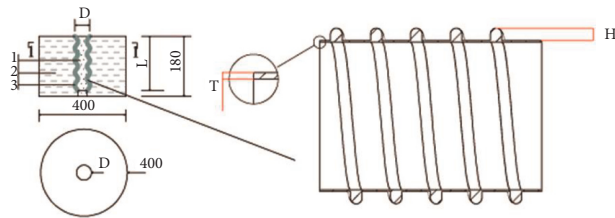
Specimen size and pipe size (mm). 1-Grout, 2-Concrete, 3-Pipe material.
